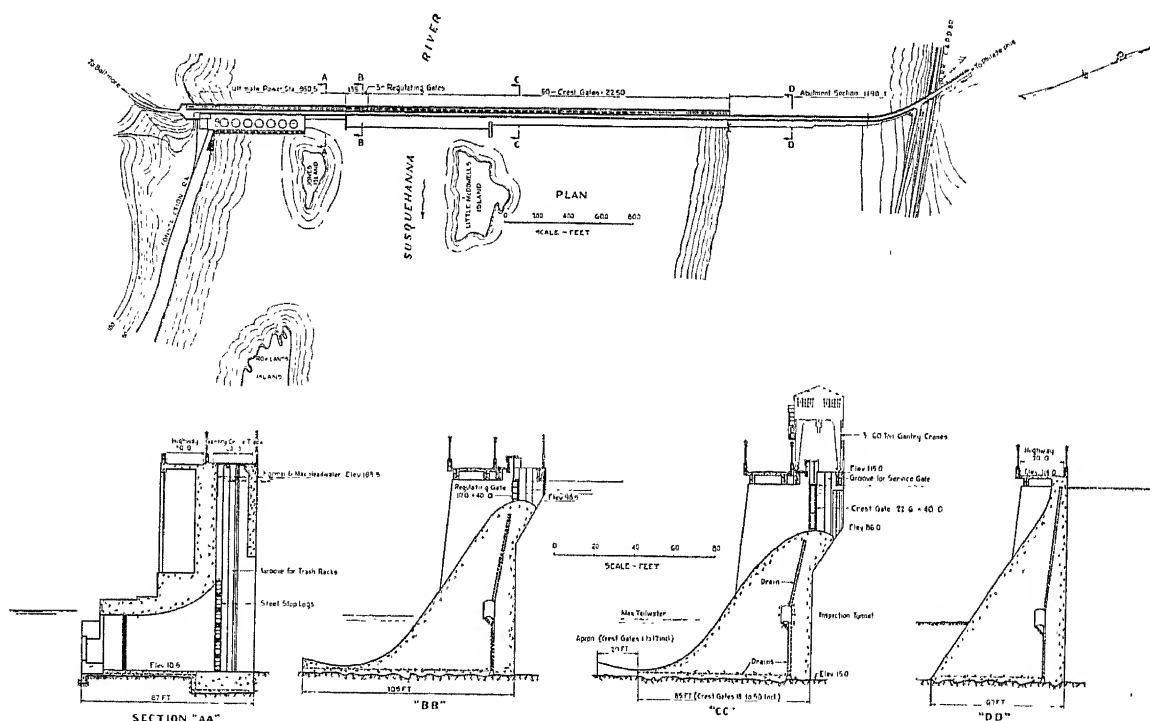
GENERAL PLAN AND SECTIONS—CONOWINGO DAM
